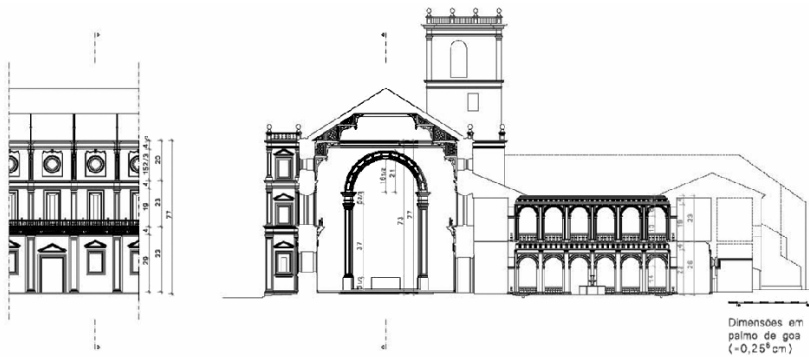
Interior elevation and section, Church of Bom Jesus. Dimensions in goa palms
